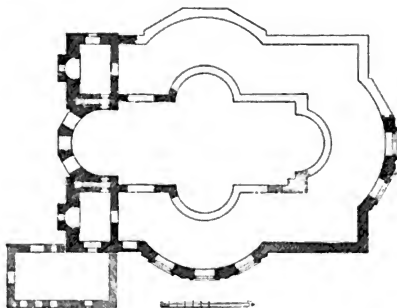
PLAN OF CHURCH AT RUSAFA.
